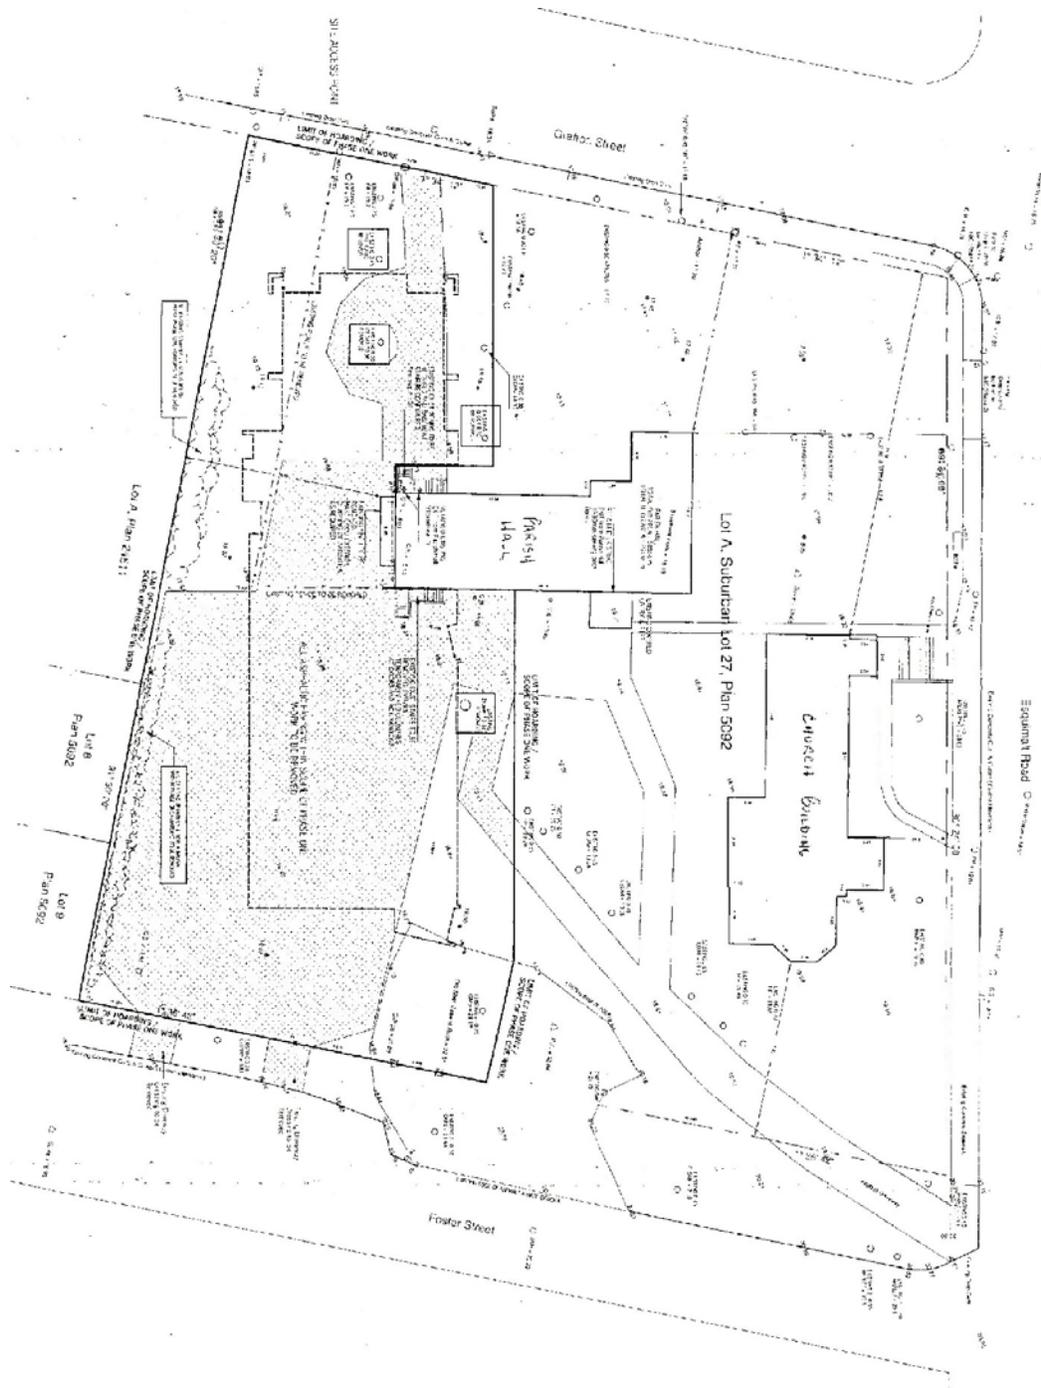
Saint Paul's Church, site plan 5092, Suburban Lot 27, Lot A. (Courtesy Saint Paul's Anglican Church)
